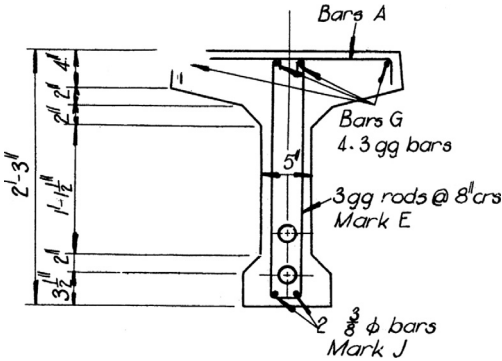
Beam cross-section showing post-tensioning details (courtesy of DIER).
